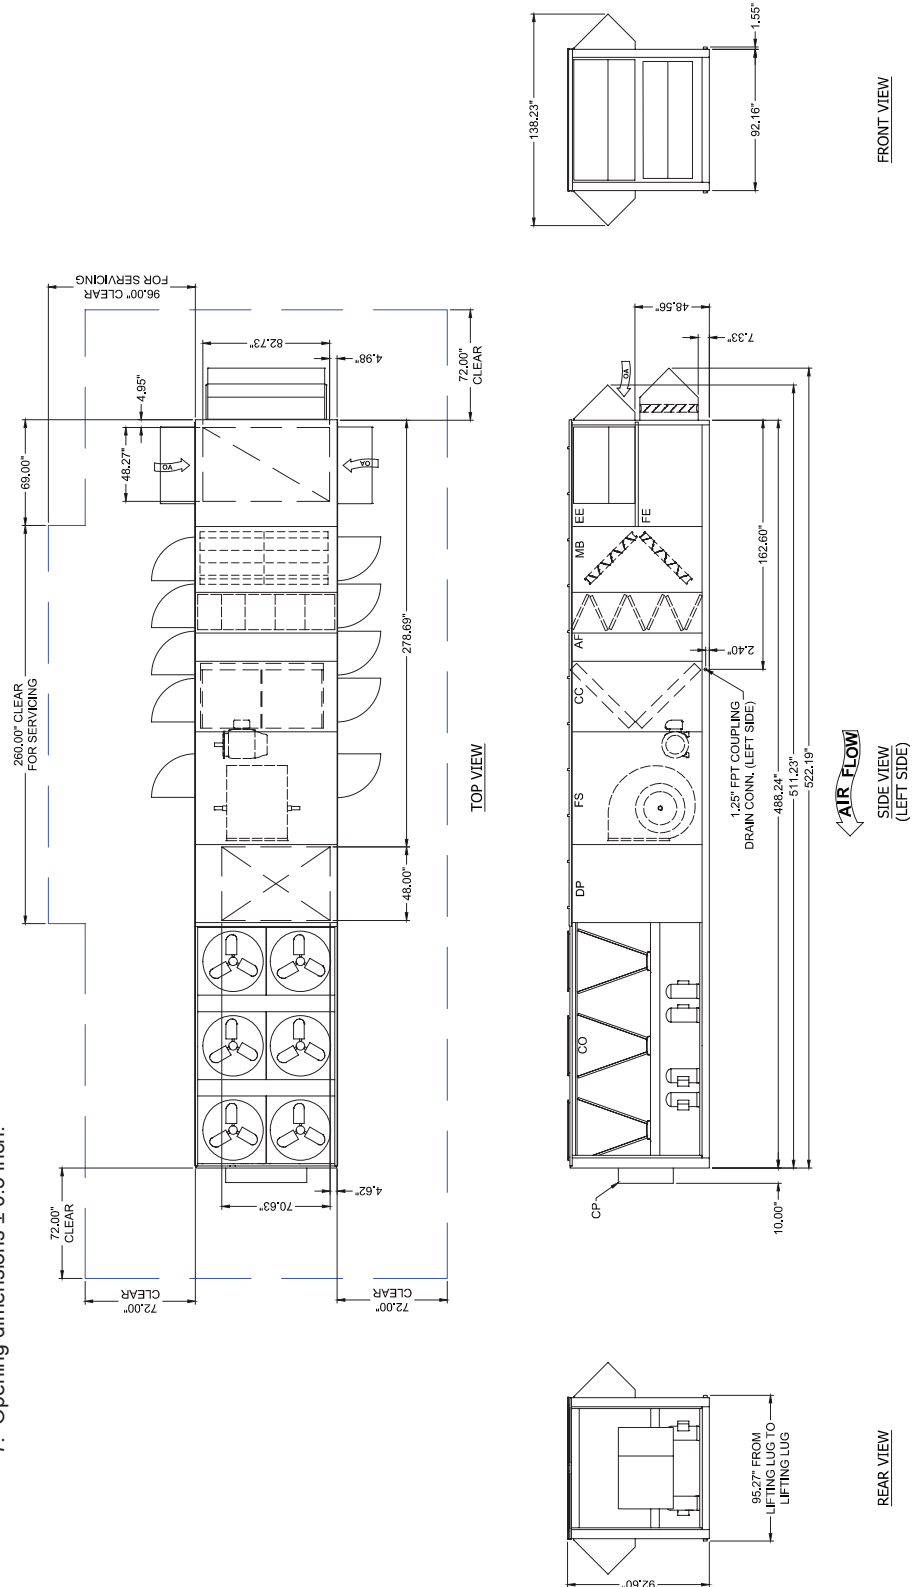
GENERAL ARRANGEMENT DRAWING
